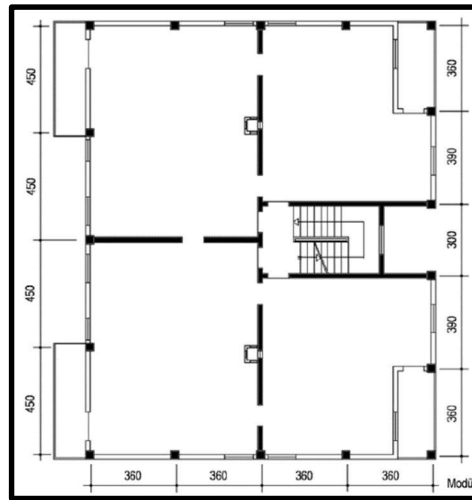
Designing the most appropriate floor plan scheme of the support building by determining their locations, shapes and dimensions of the components, such as wet space walls, installation shafts that provide the most flexibility [1].
